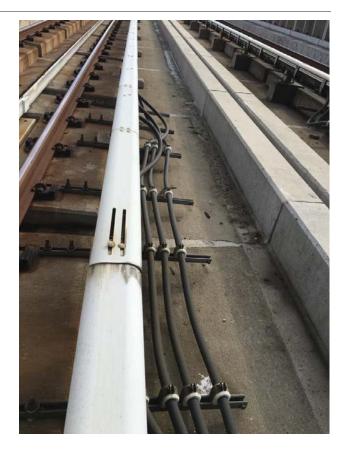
WALKING PAVERS ON CLEARANCE ZONE COLLAPSED
